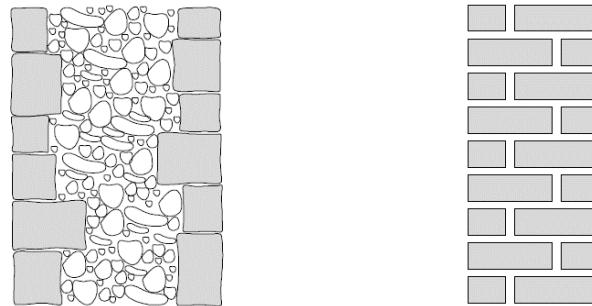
Cross section arrangement of masonry walls (Lourenço et al., 1998).
